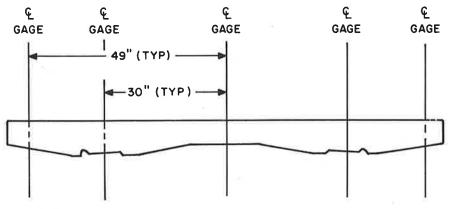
RAIL SEAT MARKING TEMPLATE DETAILS, STRAIN GAGE LOCATING FIXTURE
